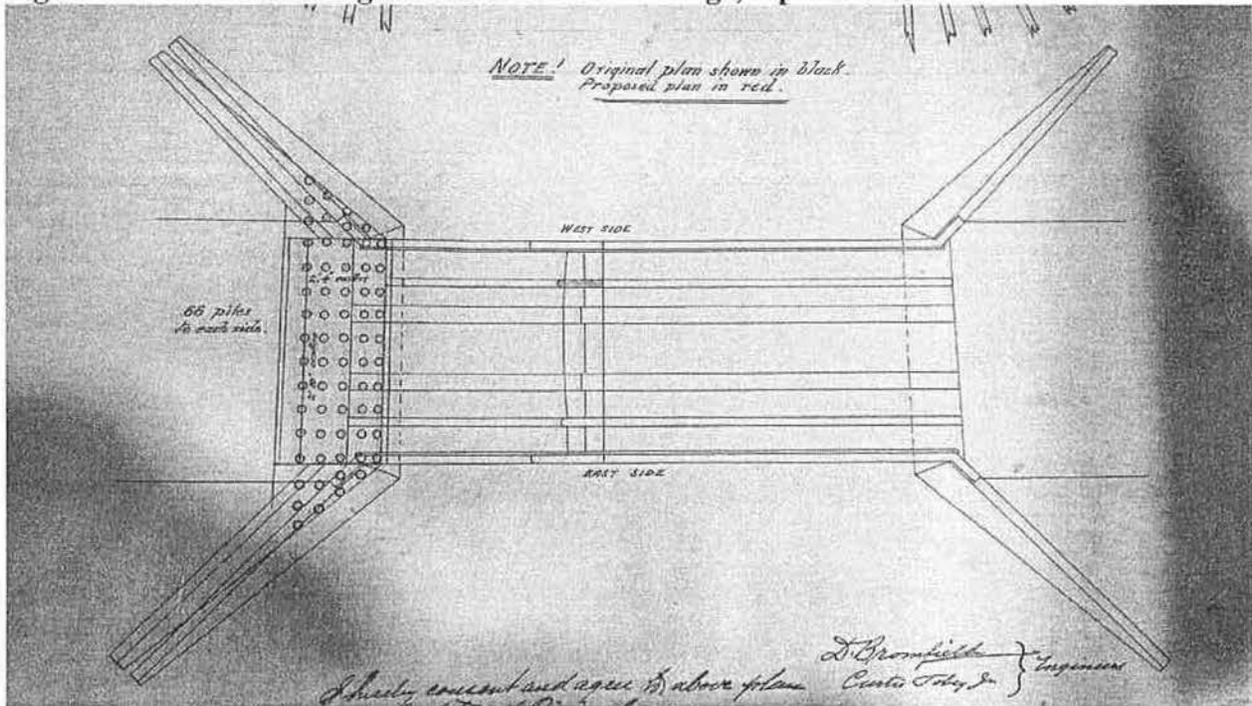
As-built drawing of Pilarcitos Creek Bridge, top elevation
